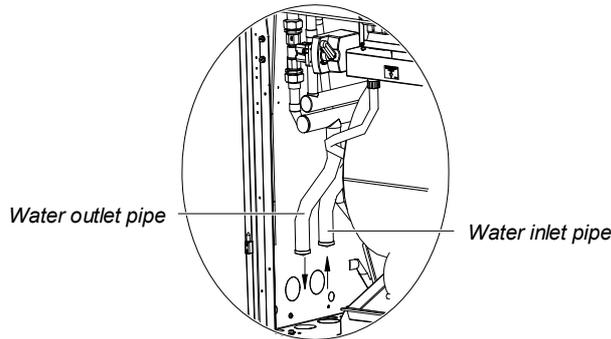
Welding figure of chilled water in and out pipes
